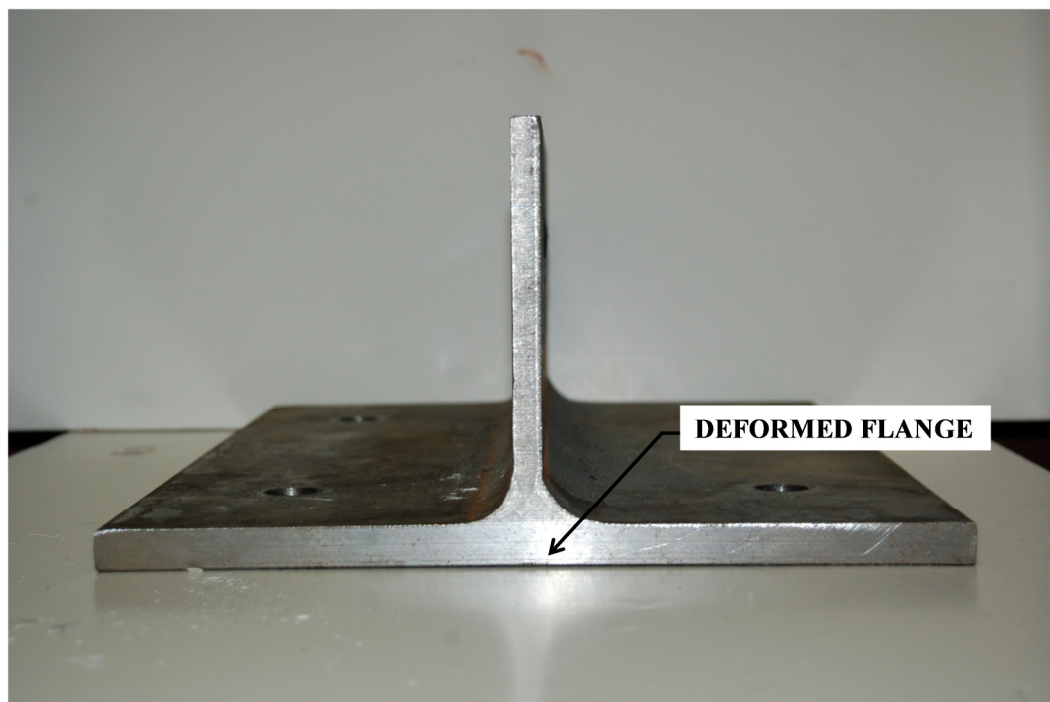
Deformed Shape for Specimen 3.0b Post-Testing.
